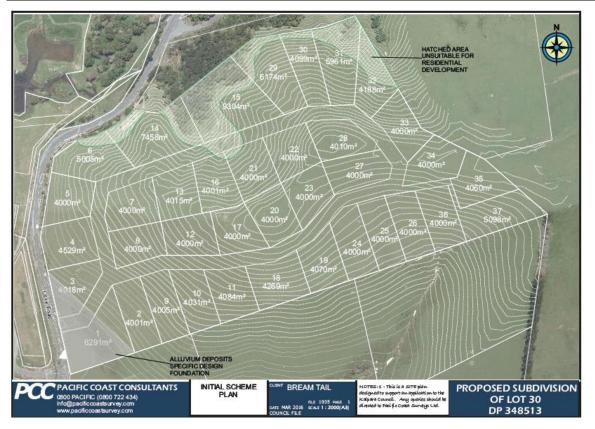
Areas requiring specific foundation design or unsuitable for building.
